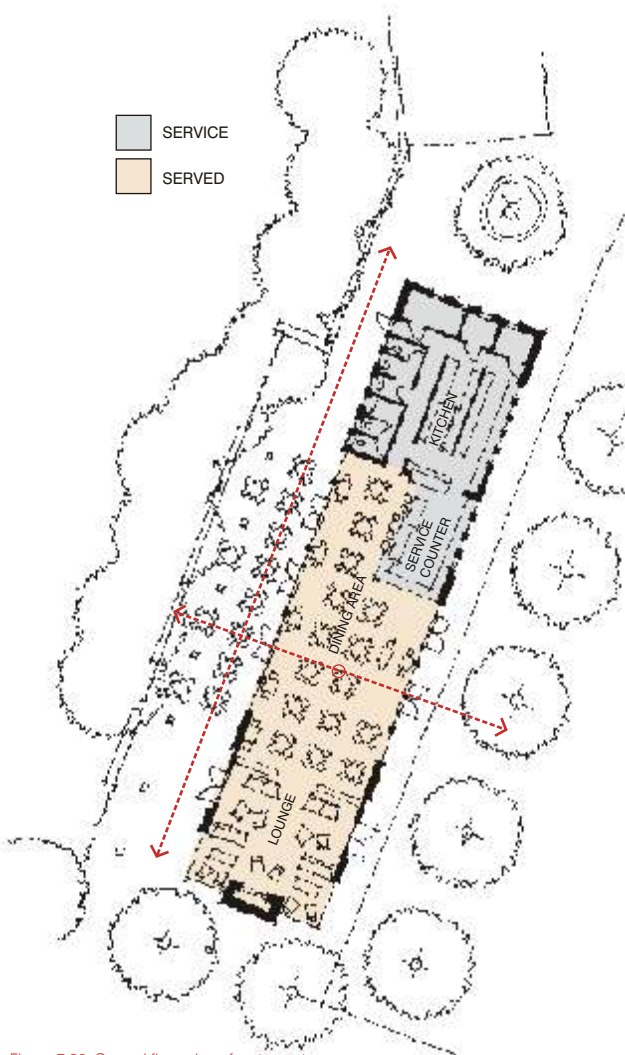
Ground floor plan of restaurant indicating space types and relationships
